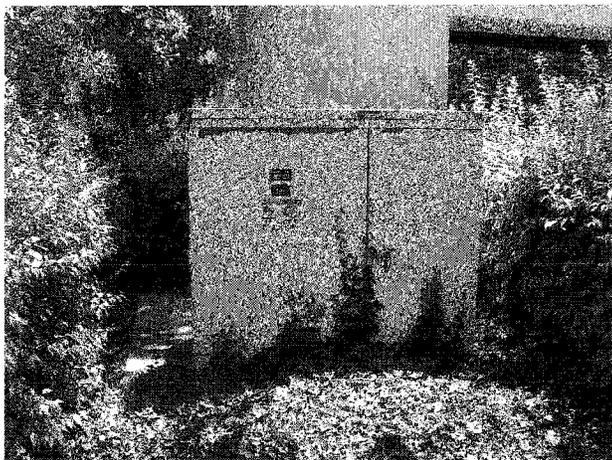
Pad-mounted electrical transformer (No. T-627) adjacent to the northeast corner of the site building
